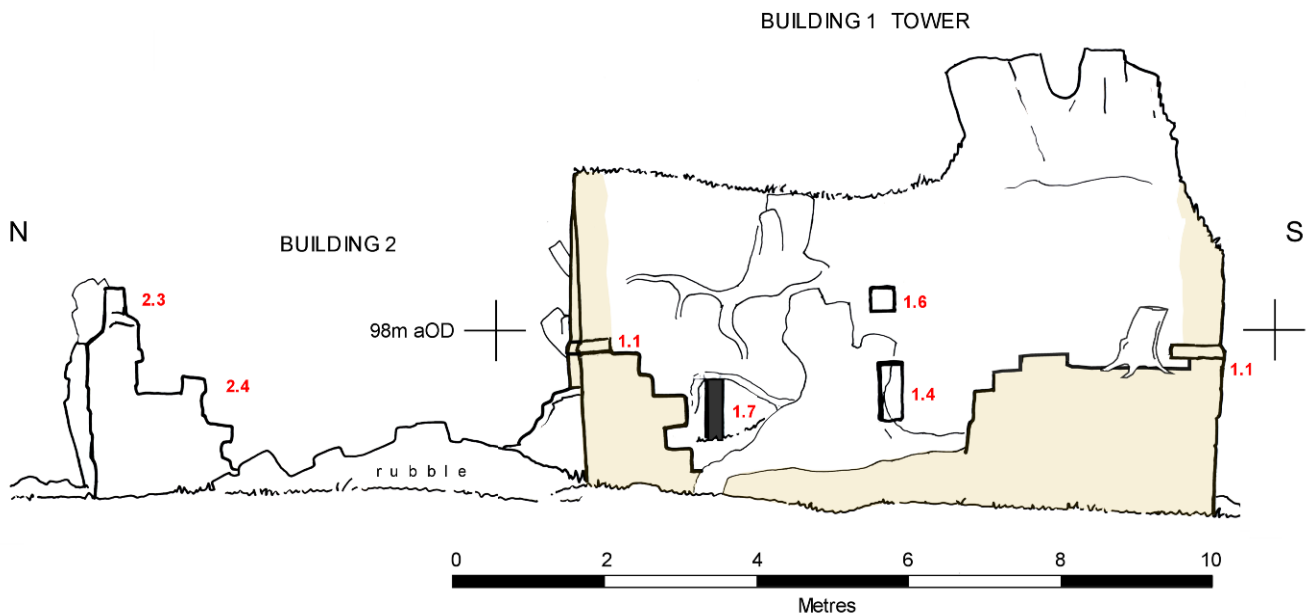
West elevation of Tower House and of Building 2. Surviving facing stones of tower in buff tone (1: 100)
